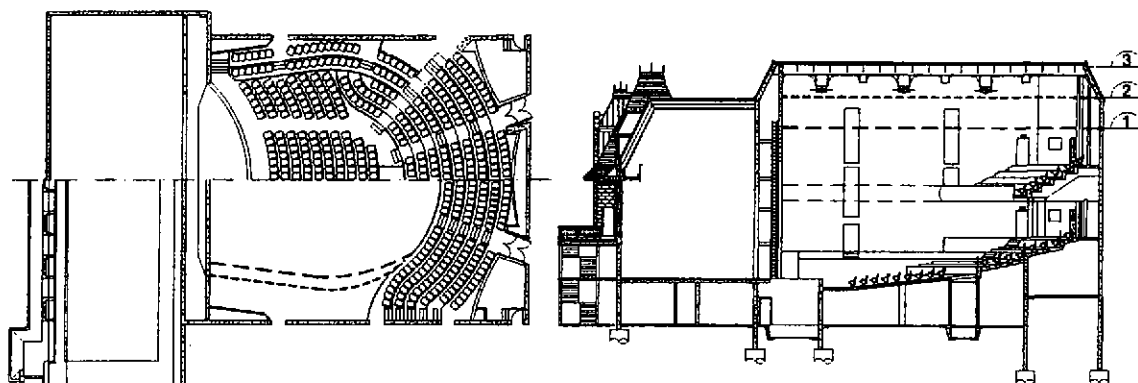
Composite Plan and Longitudinal Section of the proposed Magna A&E Auditorium.
